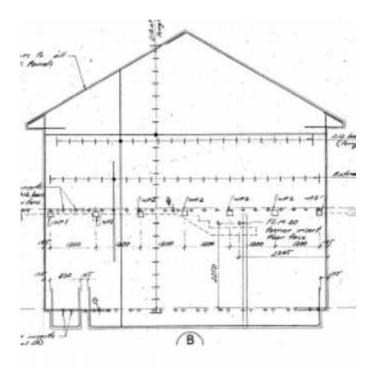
circa 1987 typical pre-cast concrete common wall tilt panel (original).
